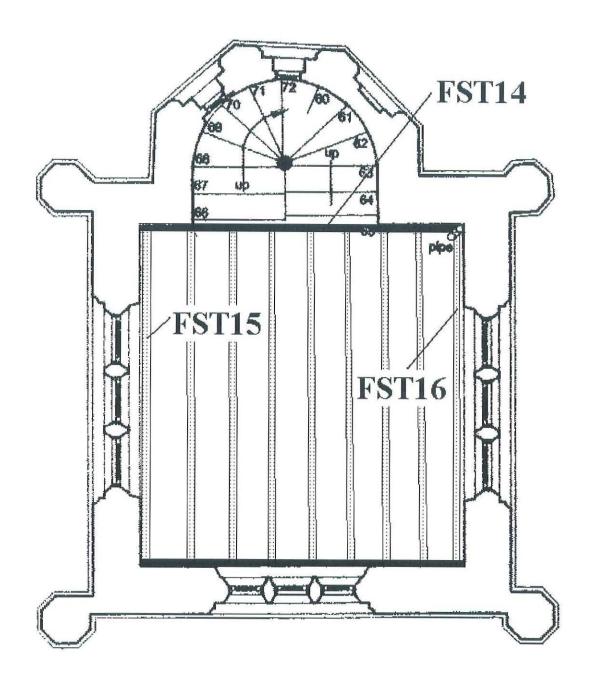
Floor plan of the fifth floor, showing ceiling joists sampled for dendrochronology, adapted from an original drawing by Richard Griffiths Architects
